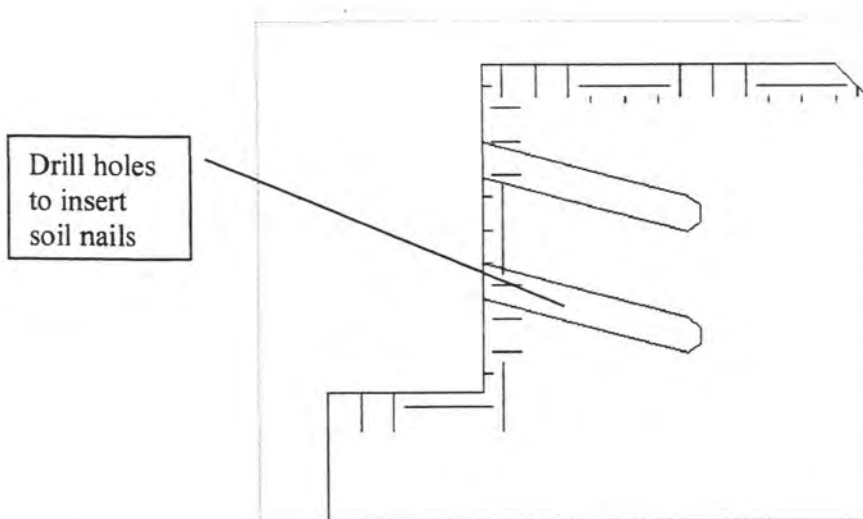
Picture showing step 2 of the construction process of Soil Nail wall
